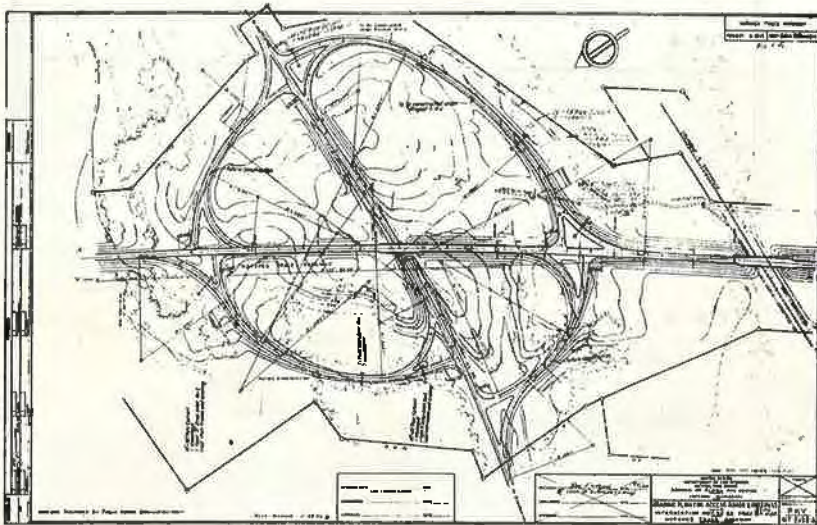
Areas of grade separation structures and major bridges can be graded to best advantage by means of grading plans. Difficult drainage and erosion control problems can be solved on these plans in the drafting room, in advance of construction.
